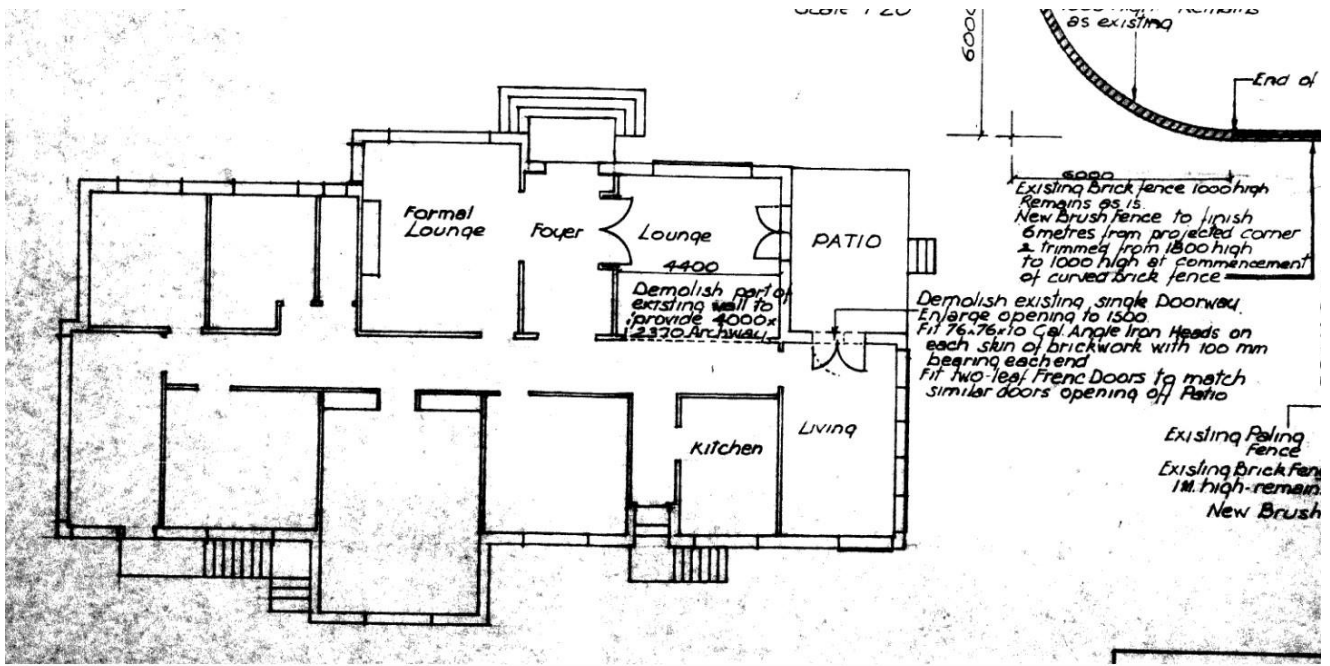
Extract of plans detailing proposed alterations and additions dated to c. 1981.
